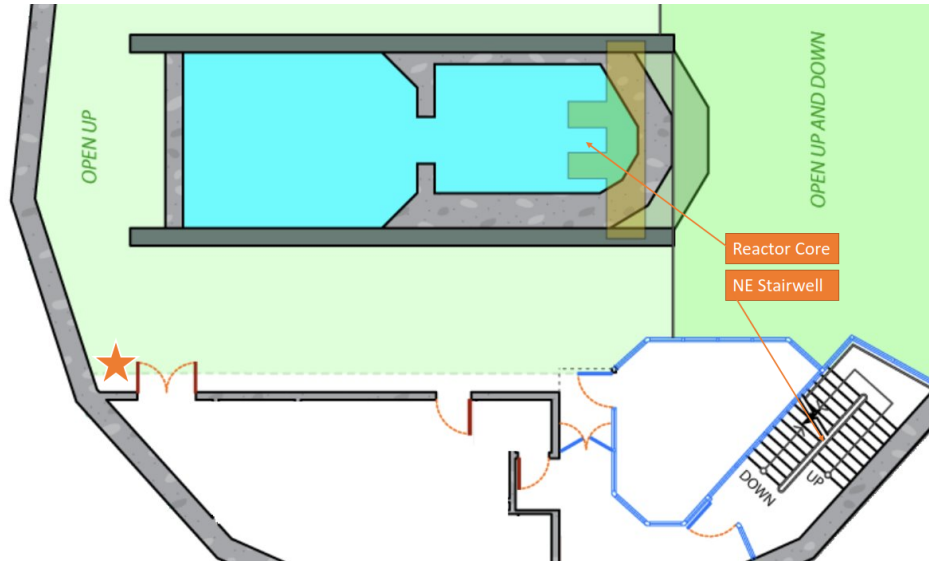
Floor plan showing Location 3, indicated by a star, in reference to the NE stairwell and the reactor core.
